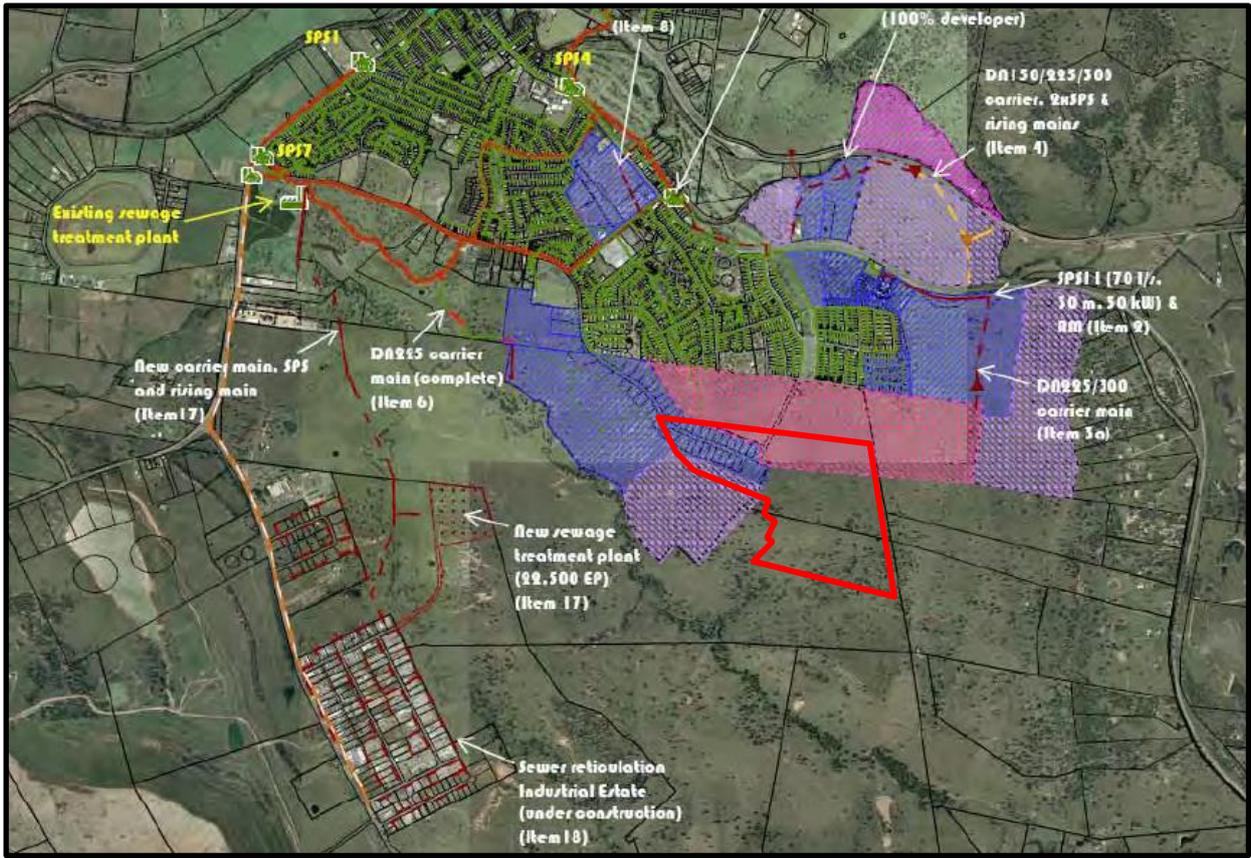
Extract from MSC Developer Servicing Plan – Sewer
